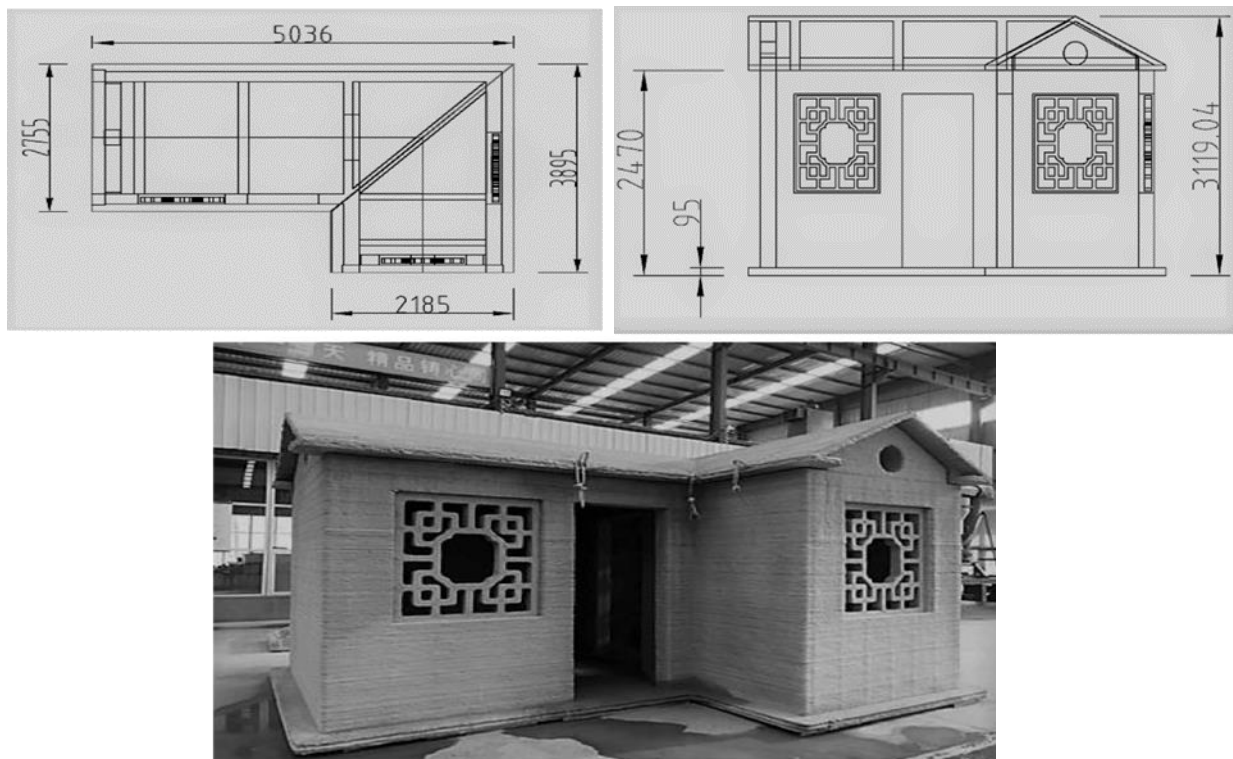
Real-world construction 3D printing and dimensions (mm) by Taikonghui, Zhengzhou Dingsheng Co., Ltd., P. R. China[25].
